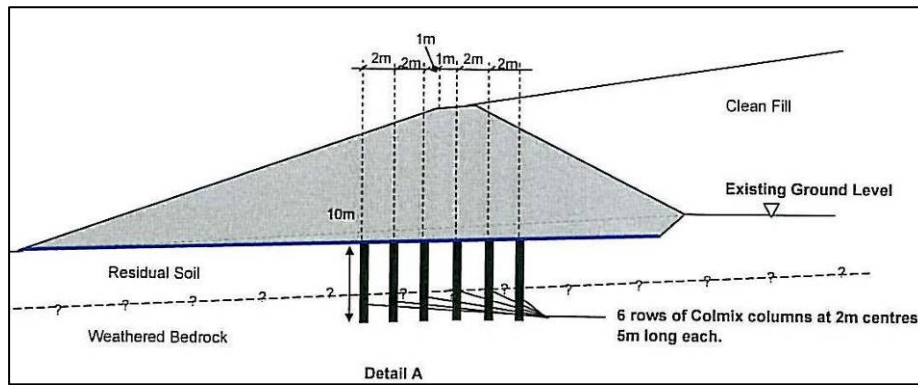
Cross section of proposed Colmix DSM columns beneath the bund
